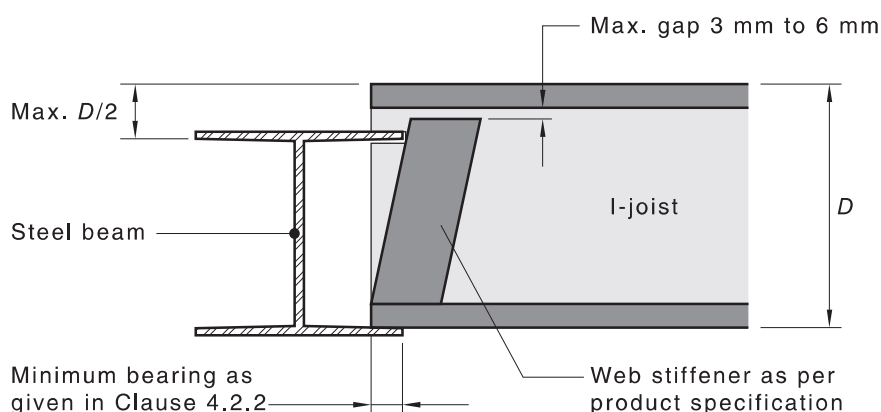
Connection of I-joists to a steel beam — Method 2
